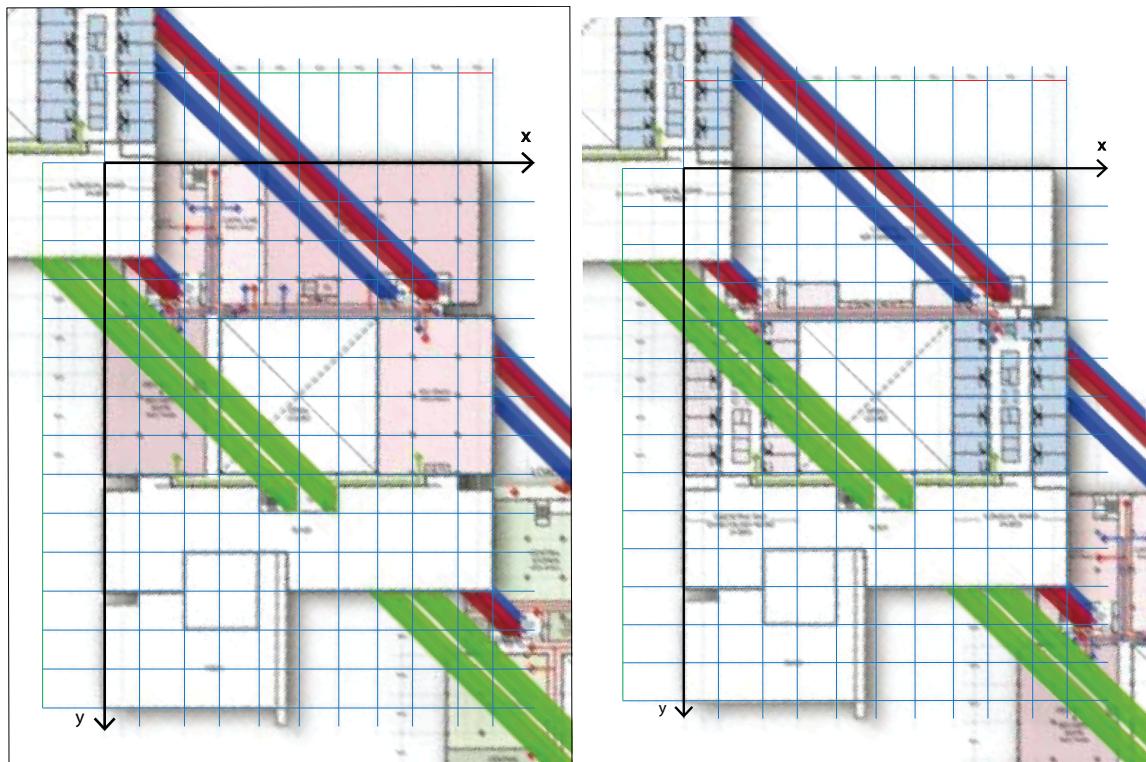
The zooming of two floor plans, with evidenced the structural grid (in blue):
